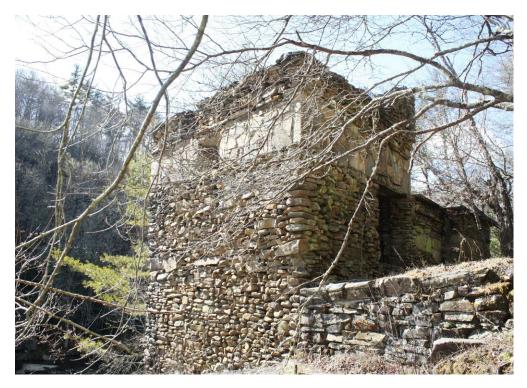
Powerhouse on the north end of Sloops Lake Dam (AV0082).
